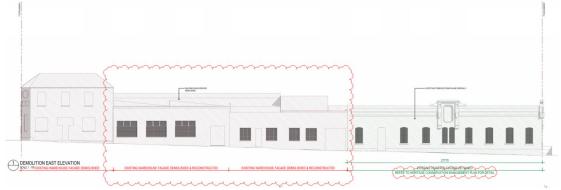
Proposed amendment to façade (excerpt from Drawing SD05_05 (Rev 47) - Demolition Elevations, prepared by SJB)
